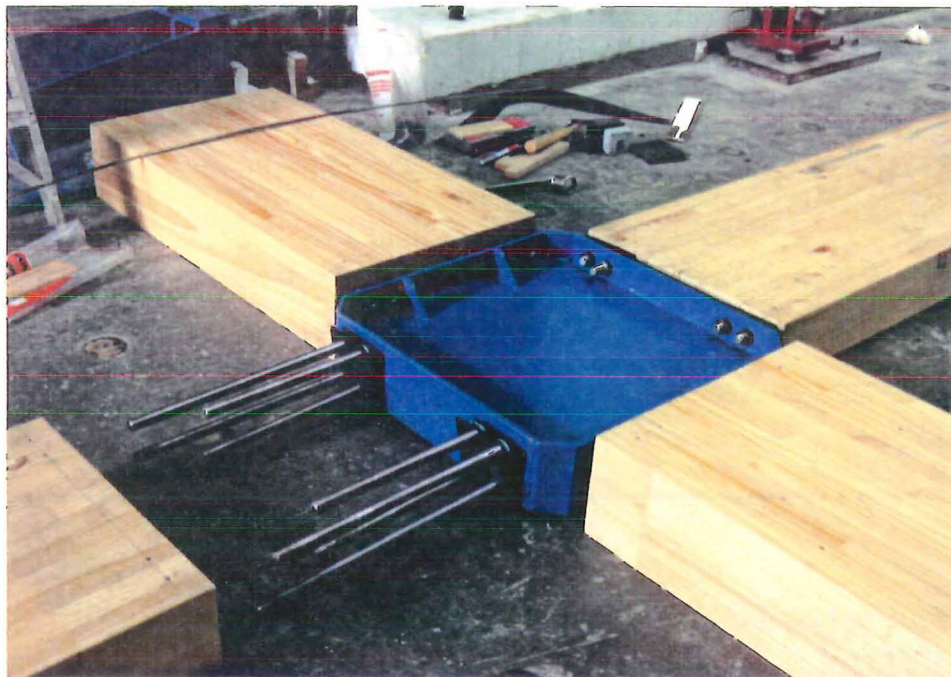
Assembling a connection using epoxied steel dowels and prefabricated steel bracket
